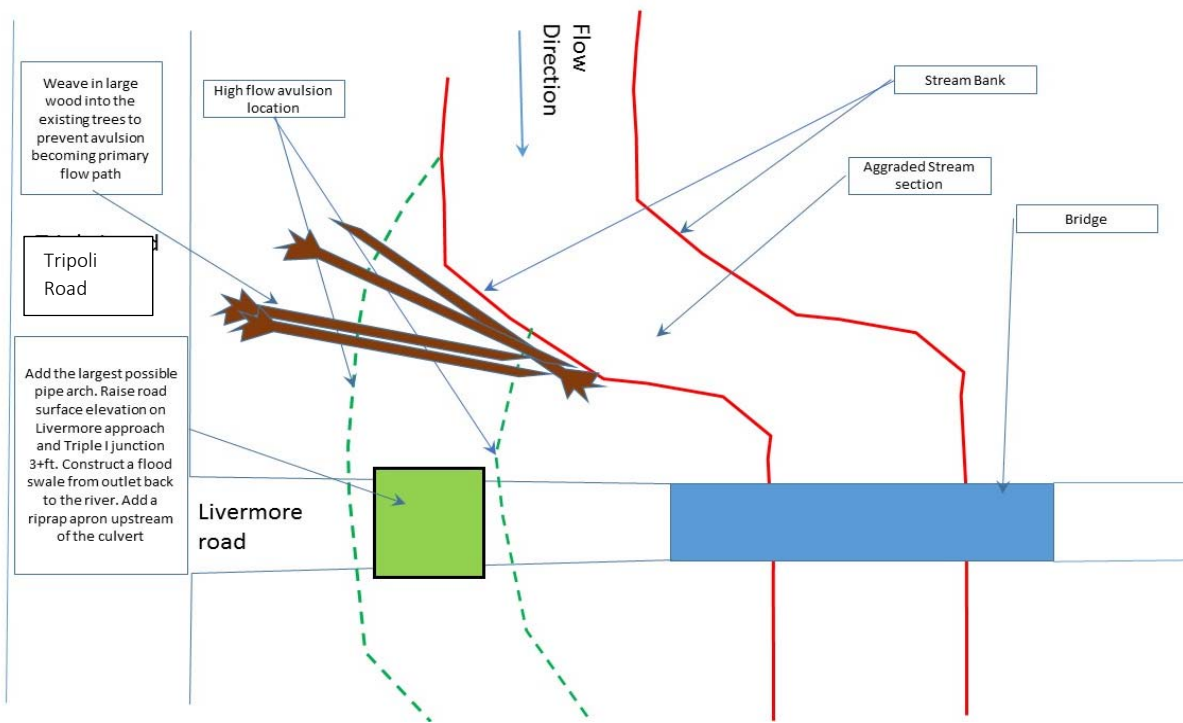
Schematic plan view of conceptual proposed solution to overbank flooding the roadway at Triple I and Livermore road junction
